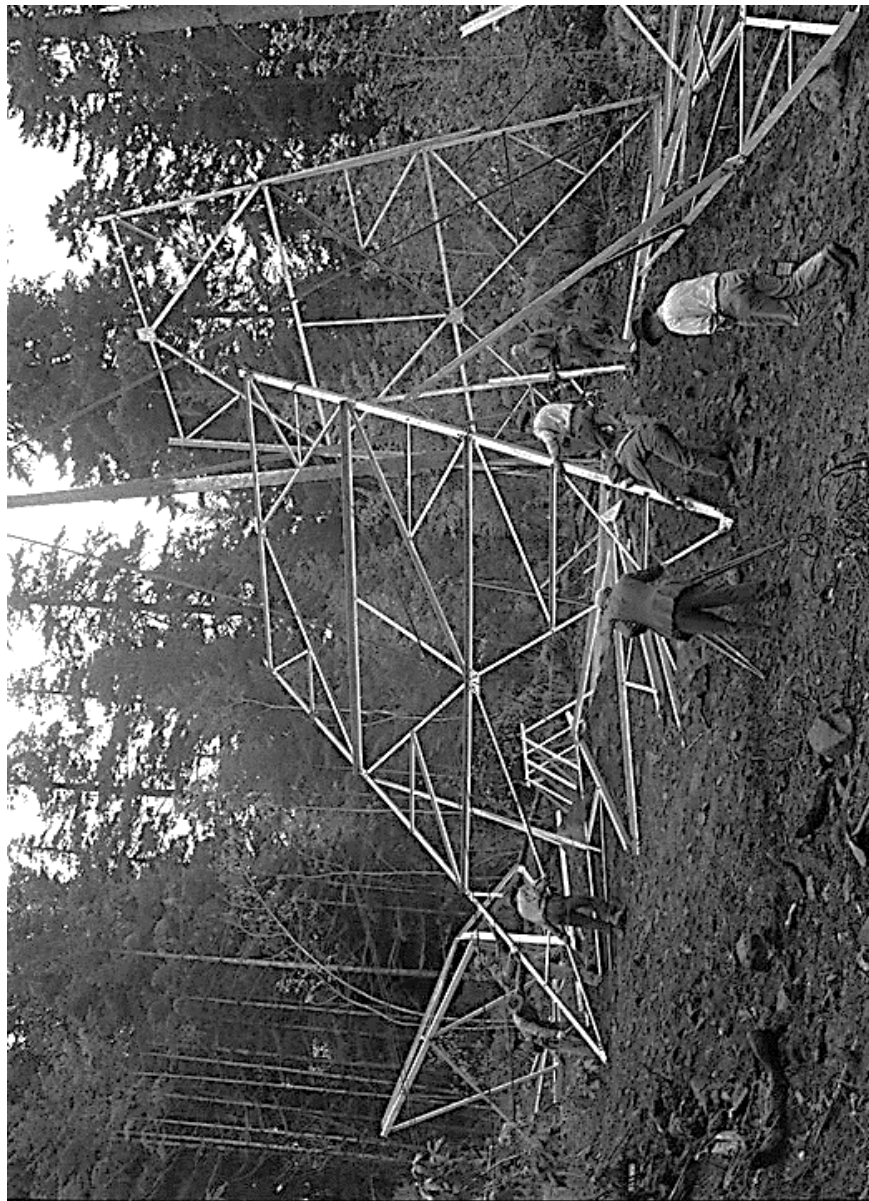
Parris Emery (cameraman) making movies (*Hydro*). Erection of tower looking north of Bonneville at or near tower No. 60.
